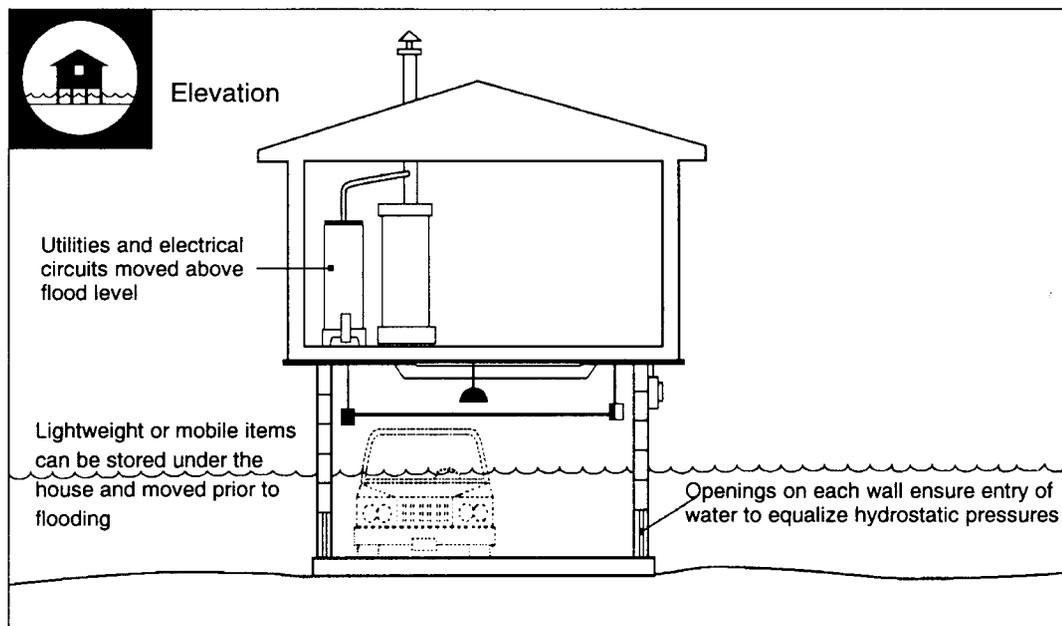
Elevation on Solid Perimeter Foundation Walls.
